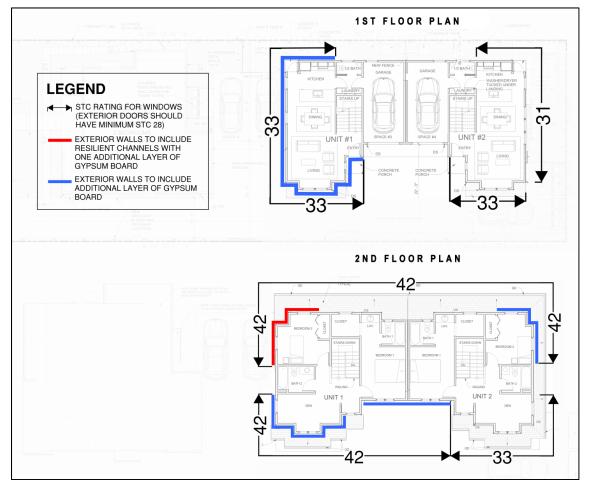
Recommendations for Windows, Exterior Doors and Exterior Walls
